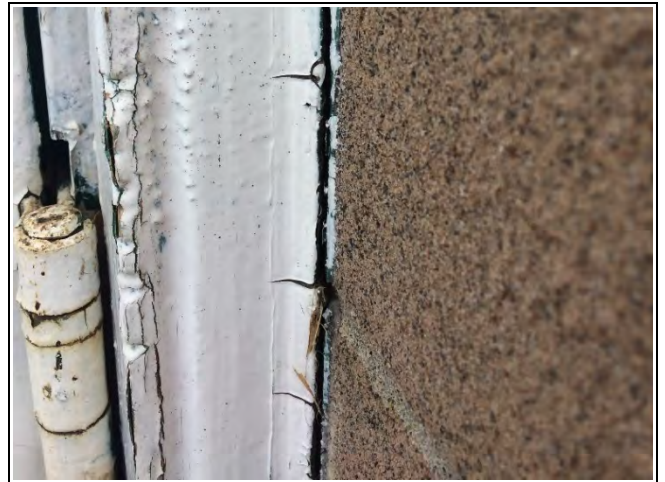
Asbestos-containing exterior caulking – dark brown (0.53% Chrysotile) at the back entrance door.
